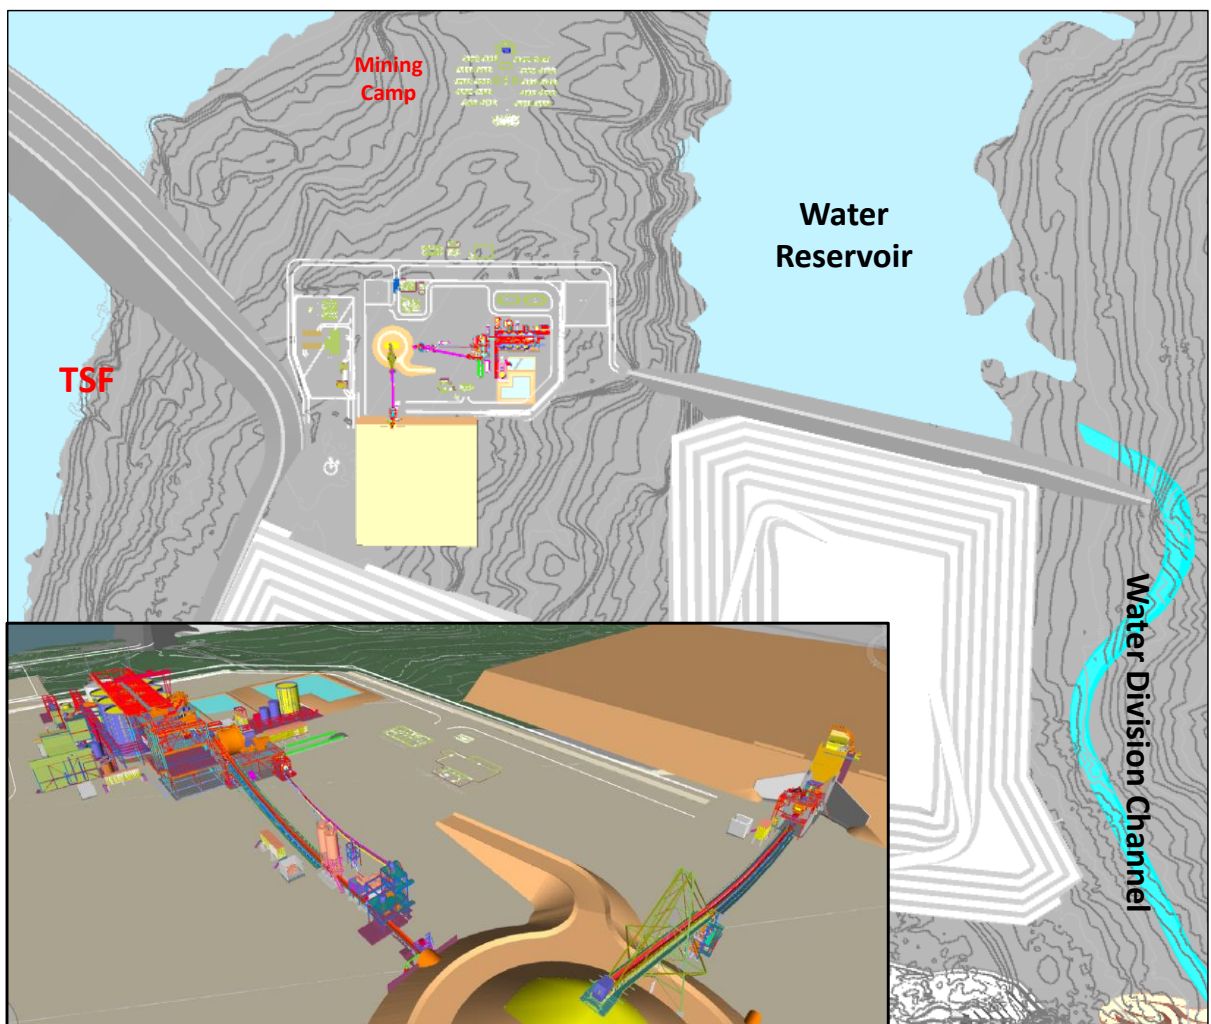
3D Model of Processing Plant and part of mine site infrastructure layout
